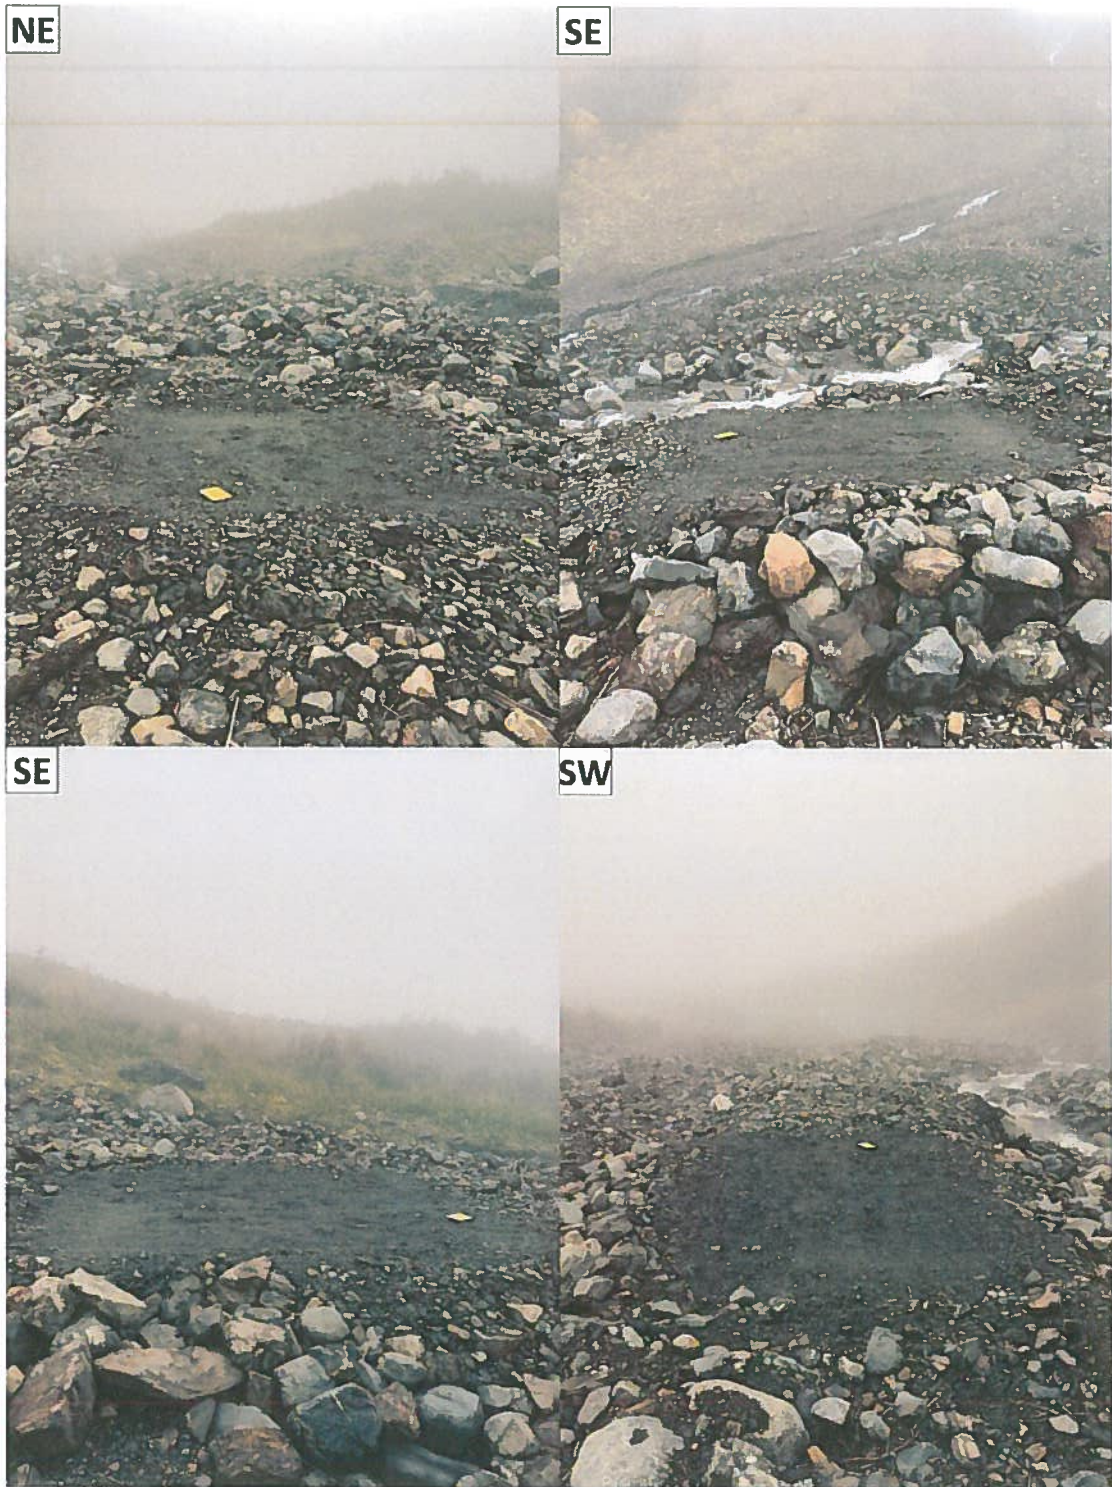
Waterfall Pump Pad site fully reclaimed in 2022.
